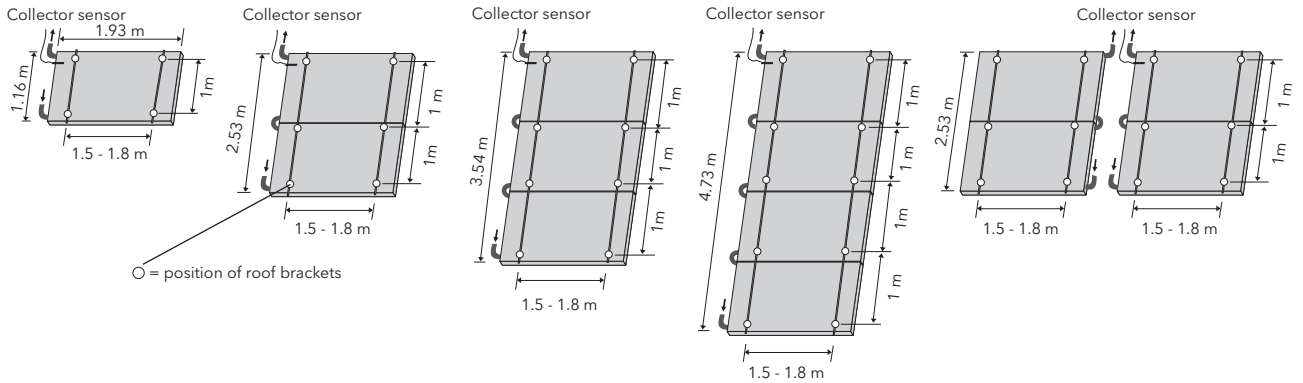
Horizontal collector arrangement: Up to 4 EURO C22 in serial connection. The mounting rails run vertically. Combination of parallel and serial connection (see right) is possible as well.
